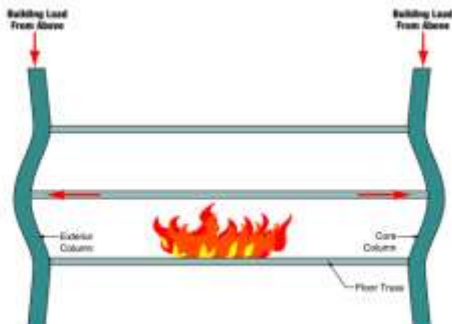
Expansion of floor slabs and framing results in outward deflection of columns and potential buckling.
